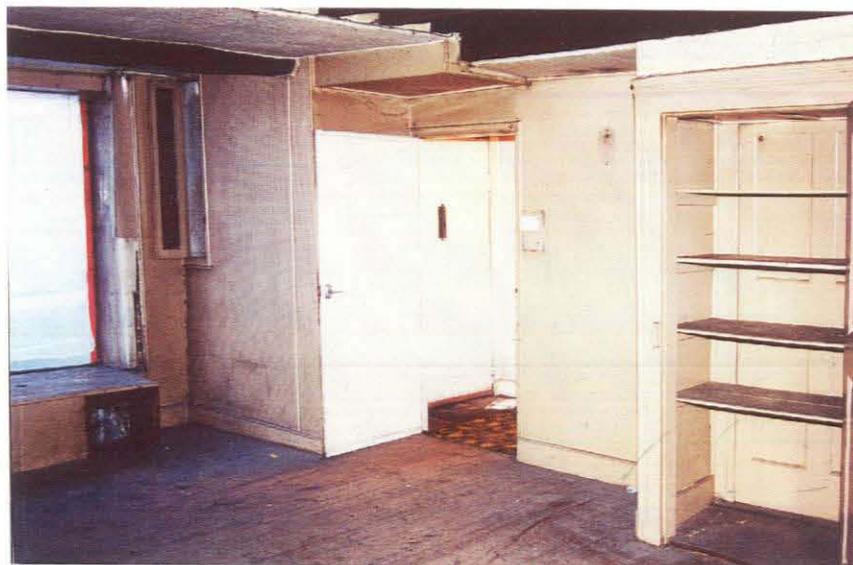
Front room 65/1, no.65; looking southeast, featuring doorway within the south wall, walk-in cupboard and the southern end of the "shop" window.
